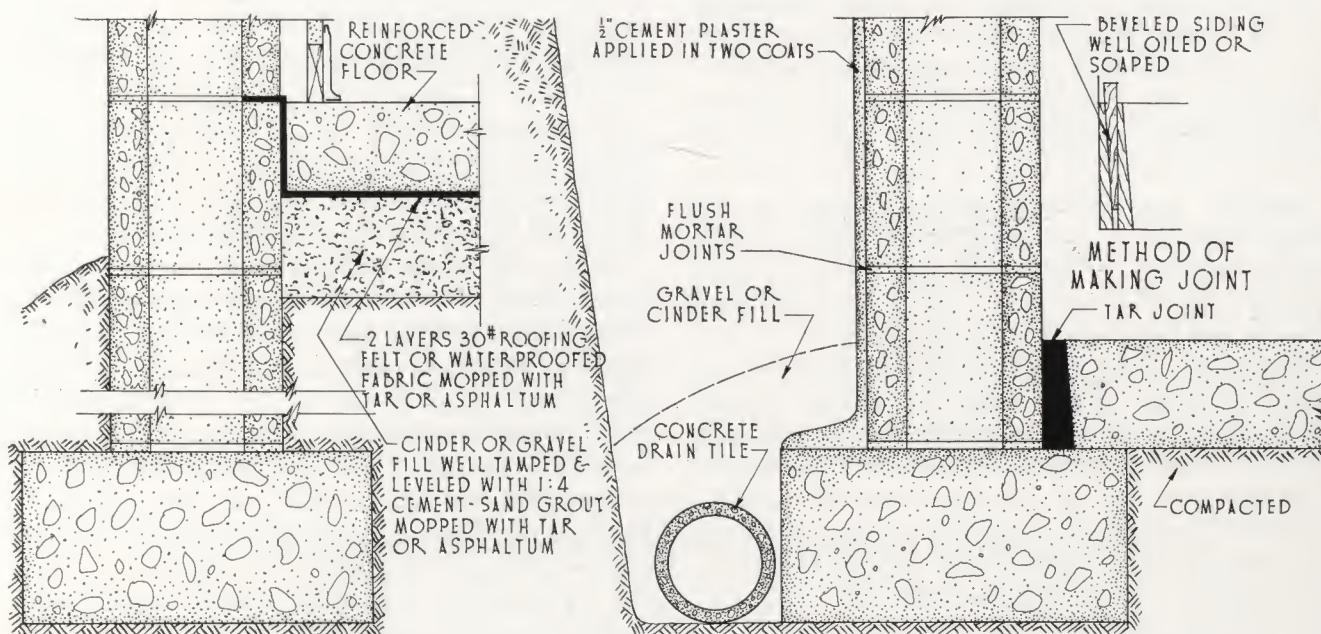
Adequate foundations are essential to prevent wall cracking. Drawing on left shows the proper method of placing concrete floor on fill; drawing on right illustrates proper method of making a tight joint between foundation floor and basement wall. See Fig. 37—"Four Types of Expansion Joints for Concrete Masonry Walls."
